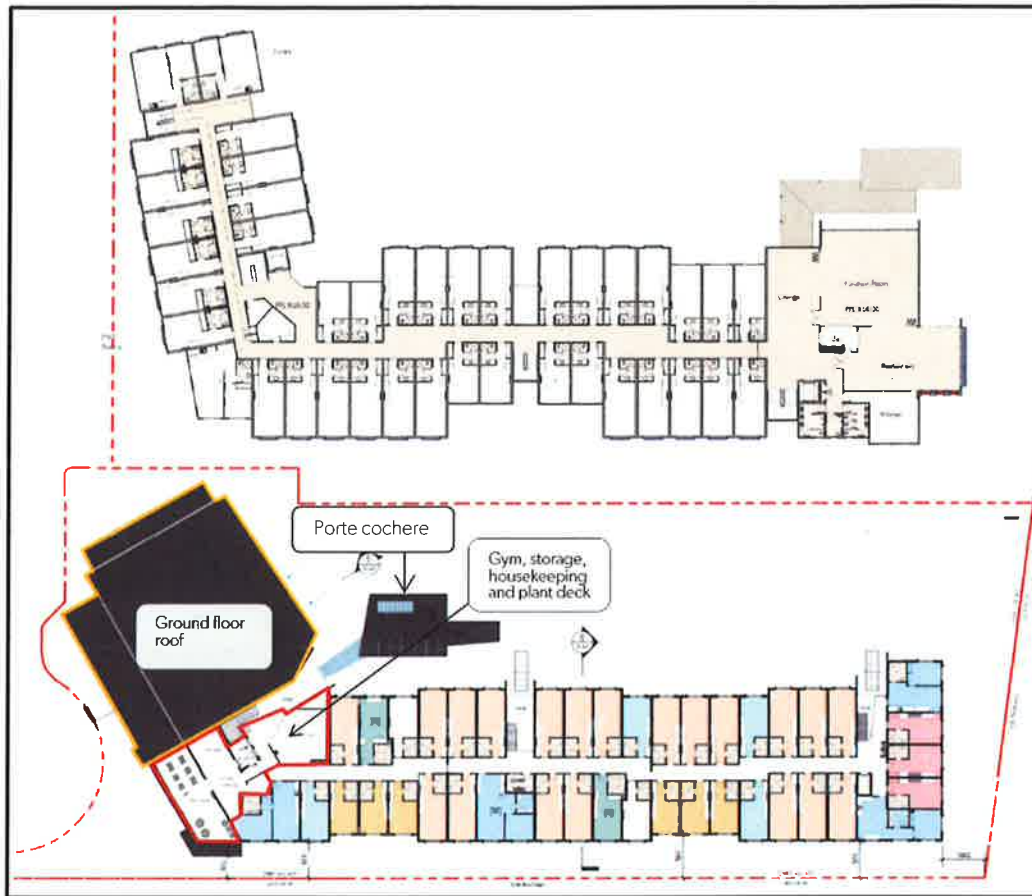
| First floor layout of Medi-Motel as approved (top) and proposed (bottom)
